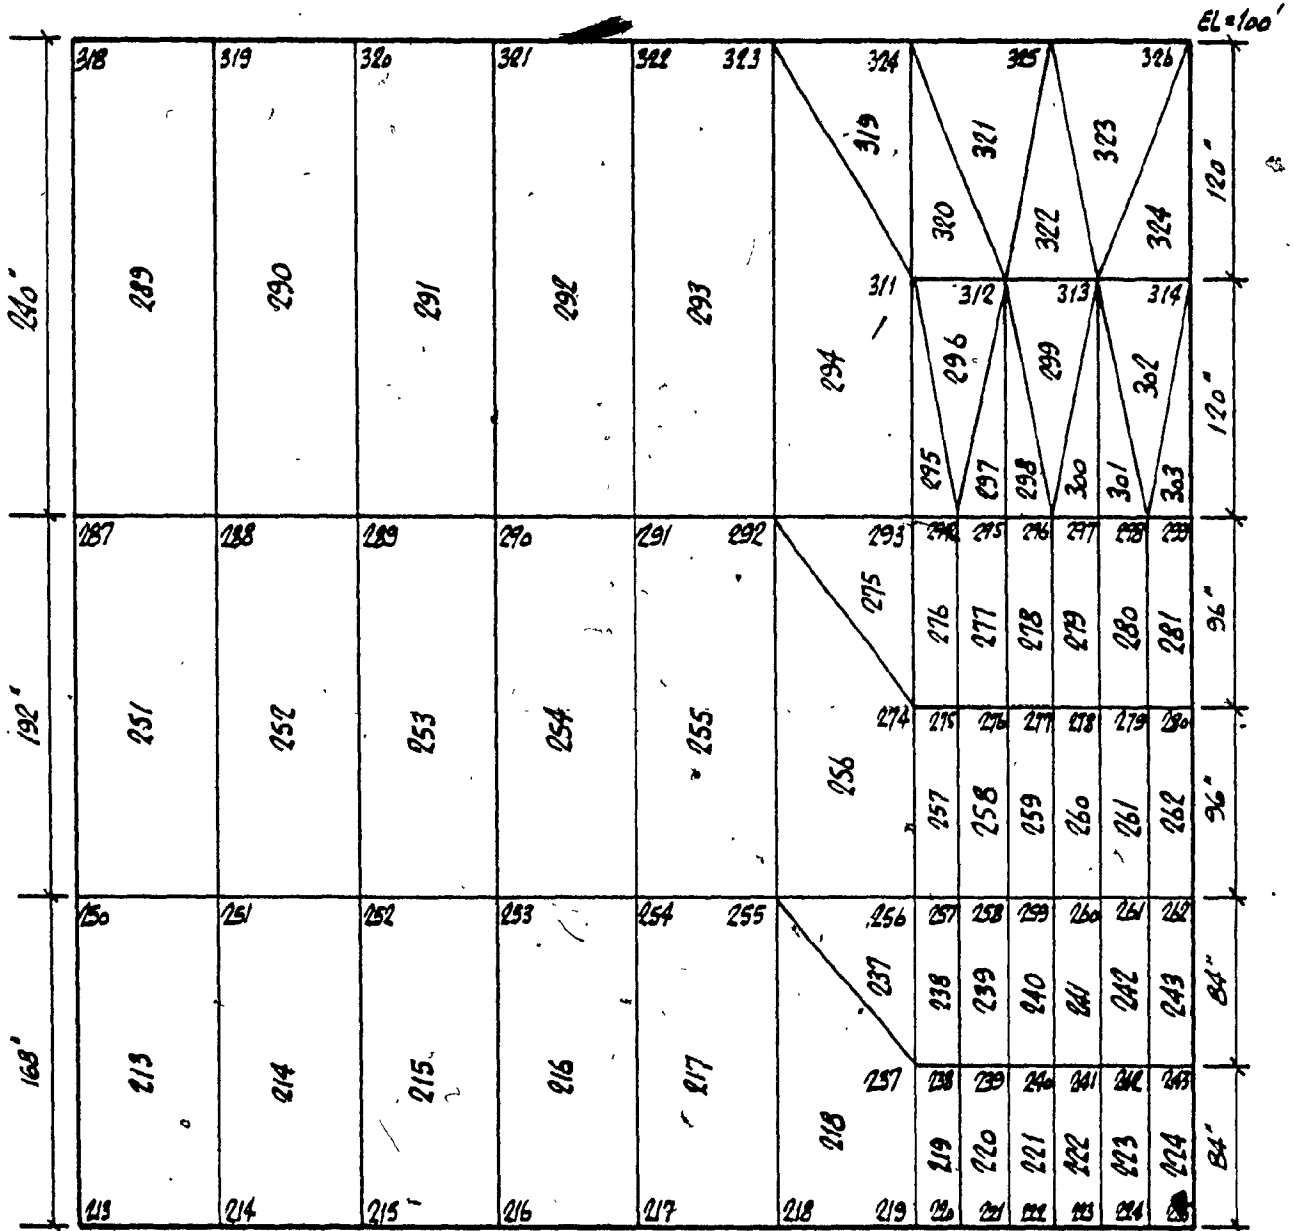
HALF ELEVATION, MODEL II, EL 50' TO 100'
